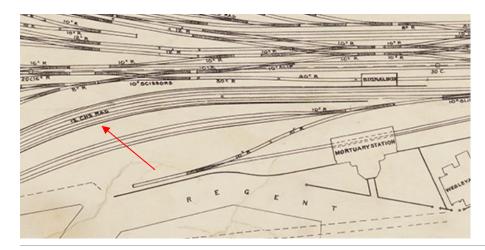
1900 plan, showing the additions to the structure. Source: SLNSW. N.S.W. Railways, Sydney Central Station: station arrangements. FL4585298.
